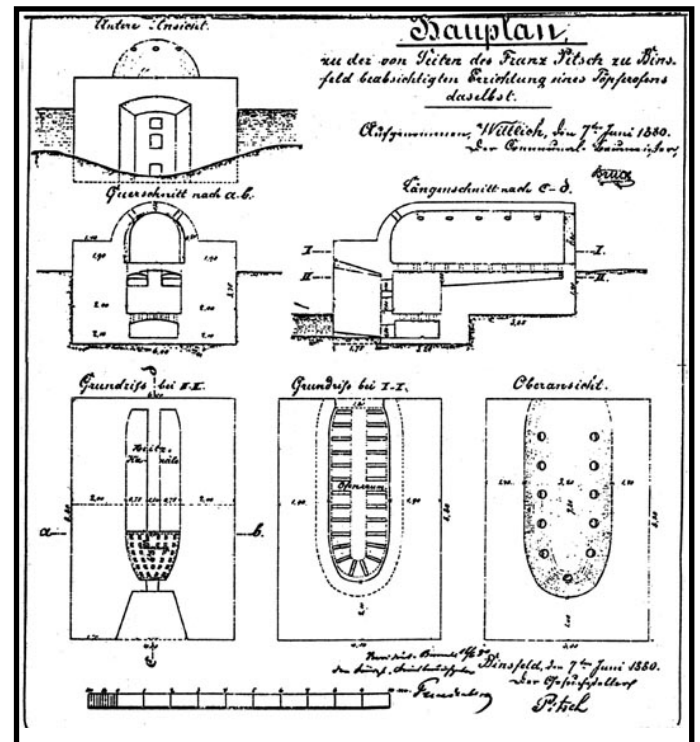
Cross-draught stoneware kiln, built in a sloping position above ground with a rectangular ground plan, one sunken fireplace and two flues, Westerwald type. Building application Binsfeld, Rheinland-Pfalz D, 1880 (Kerkhoff-Hader 1987, Abb. 17).
